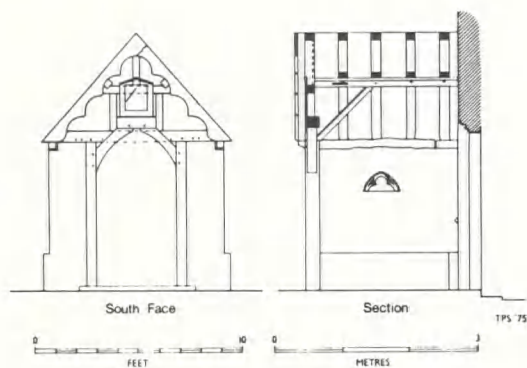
Tilsworth: church of All Saints: South Porch South Face and Section
